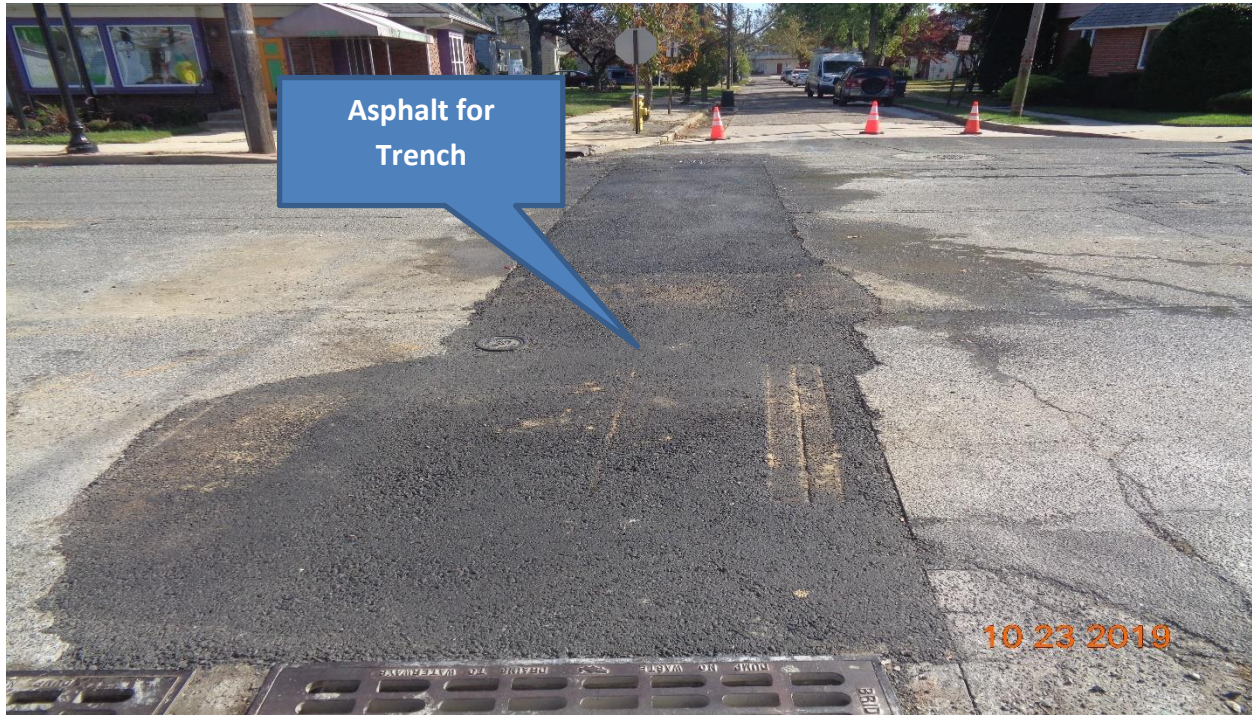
24" Reinforced Concrete Pipe, Class IV was installed across Westfield Avenue at Hillcrest Avenue.
